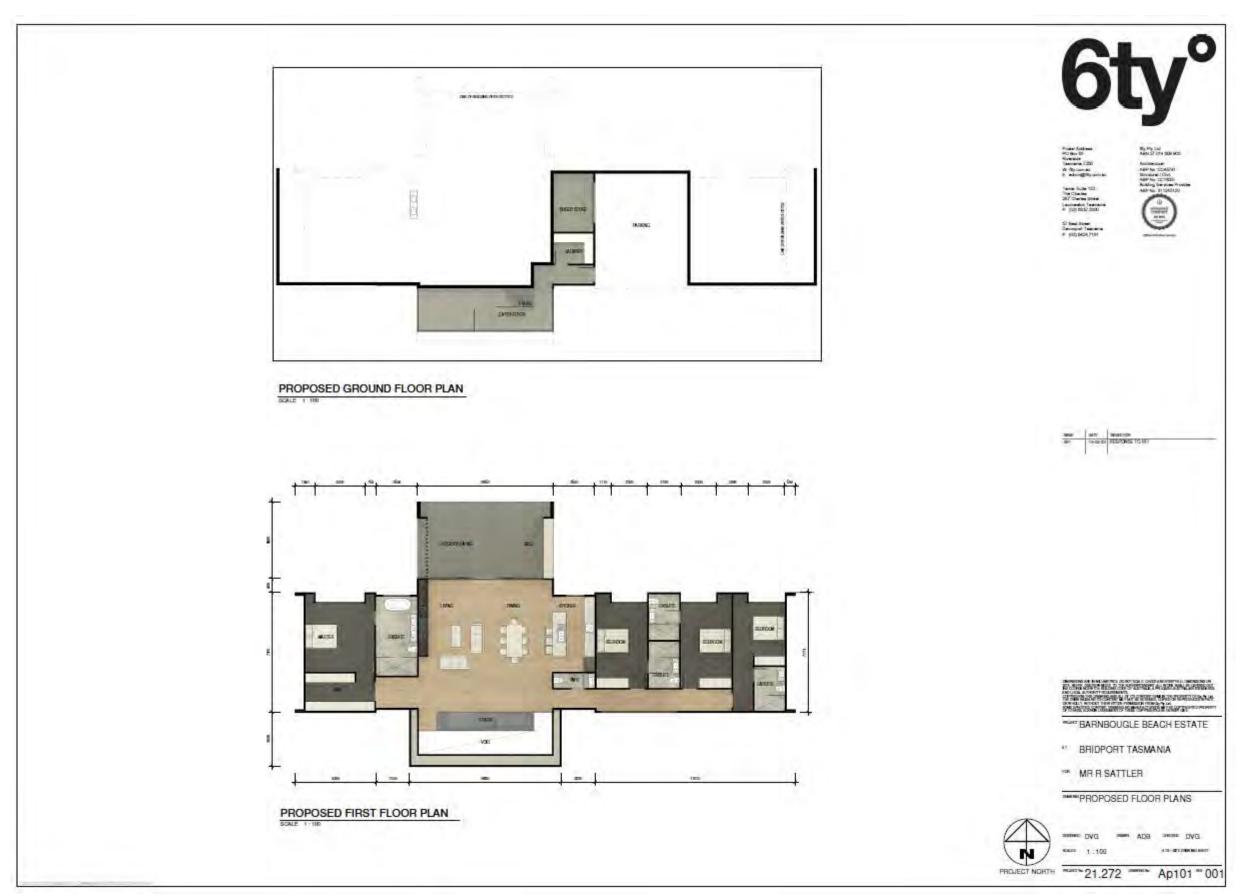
Floor Plan of proposed Unit 1 (source: 6ty Degrees 2023)
